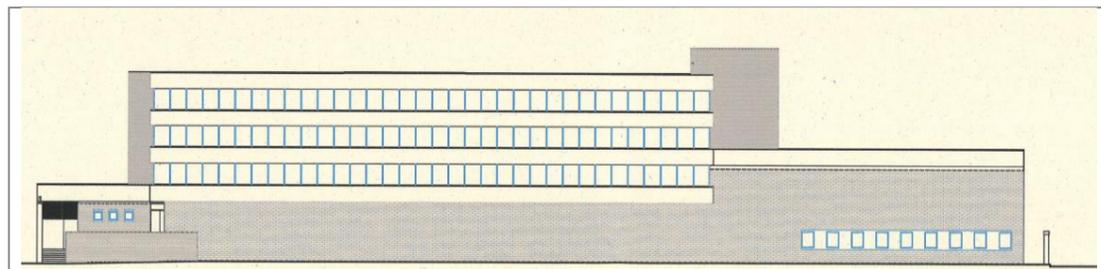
Building elevation from street level, lifted from Chamberlain Consulting LLP report of 2018.
